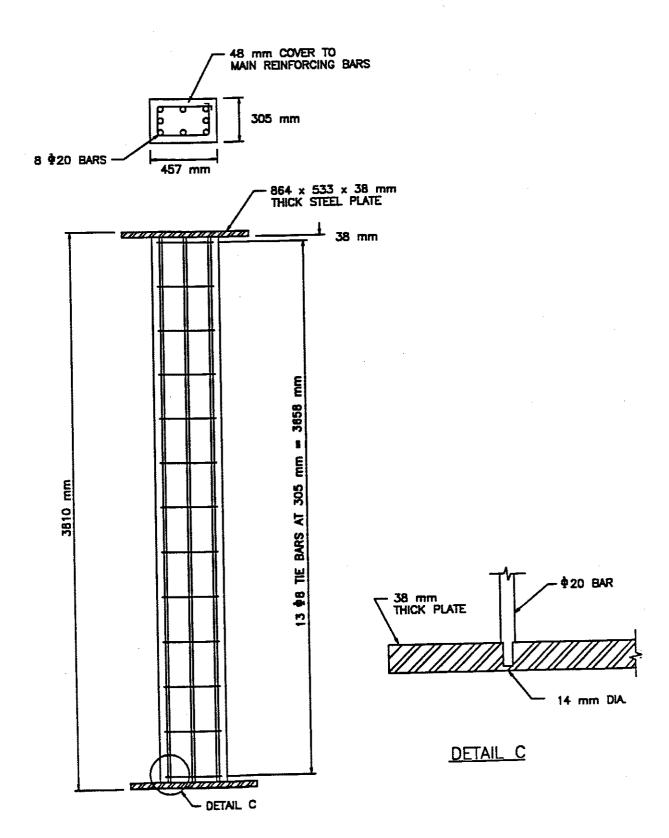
Elevation, Cross-Section and Finishing Detail: Column 1 (TFRI)
